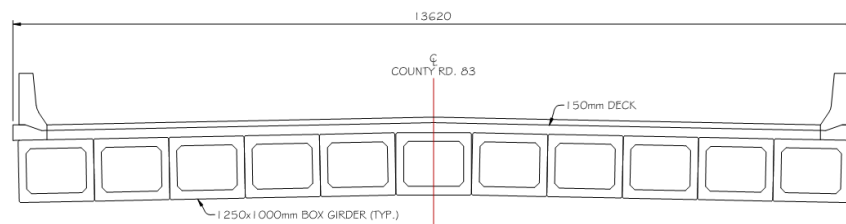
Cross-section of Huron County Road 38 Bridge: As-Tendered design
